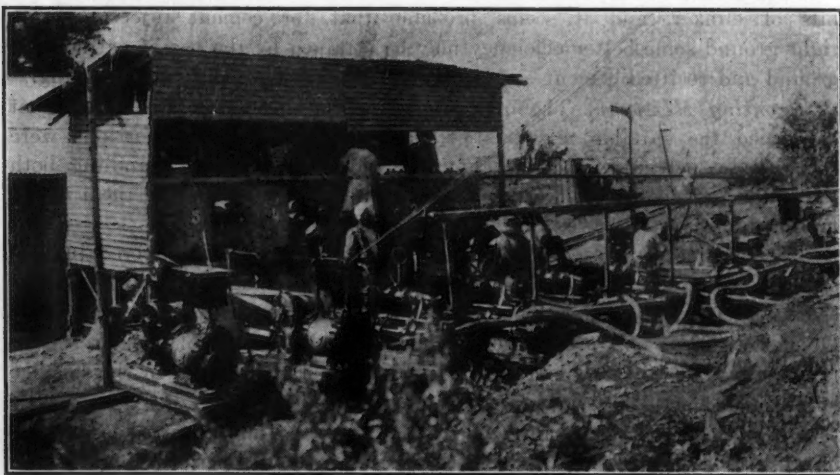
SHIRAWTA DAM; THE FIRST PUMPING PLANT, NEAR TOE OF DAM.
